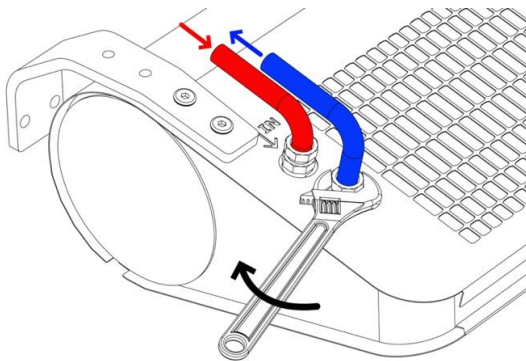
CONNECTION OF THE HEATING MEDIUM.
